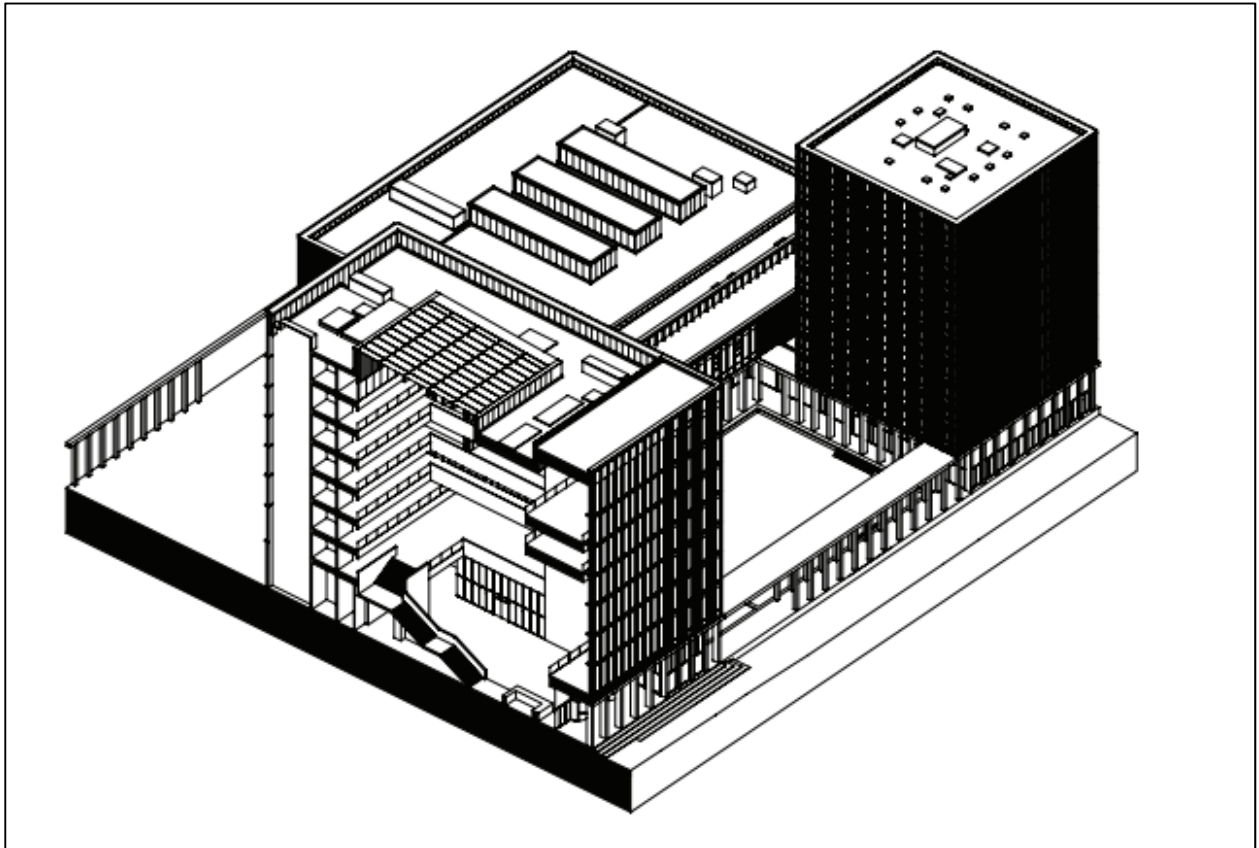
Buildings on site: Grand hall (8 floors), Workshop (double height space) and student accommodation with a cloister garden amongst them.
